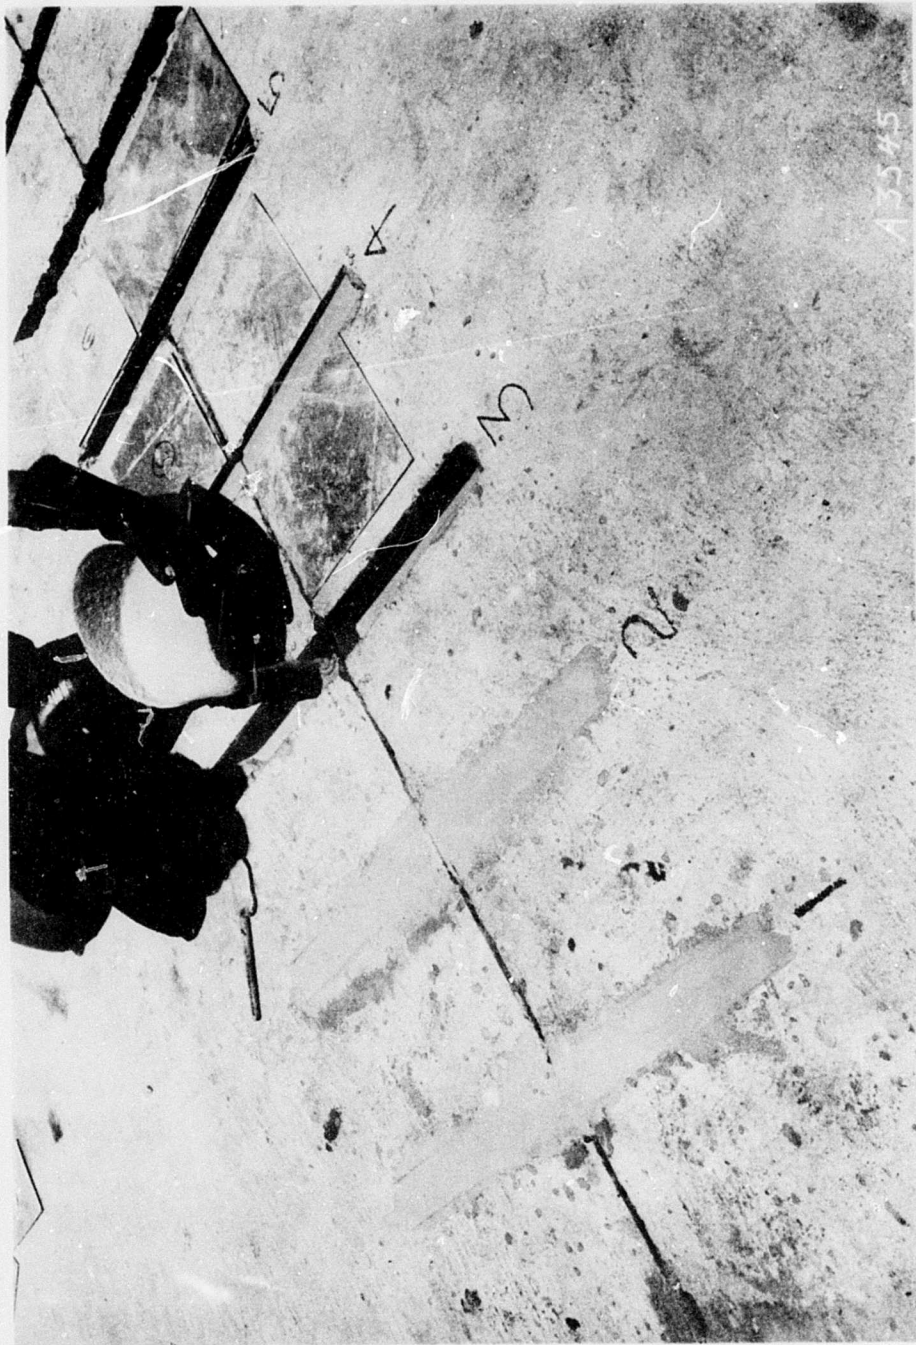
Filling sawed kerfs with epoxy mortar after tie bar has been bonded in bottom of kerf with epoxy grout.
